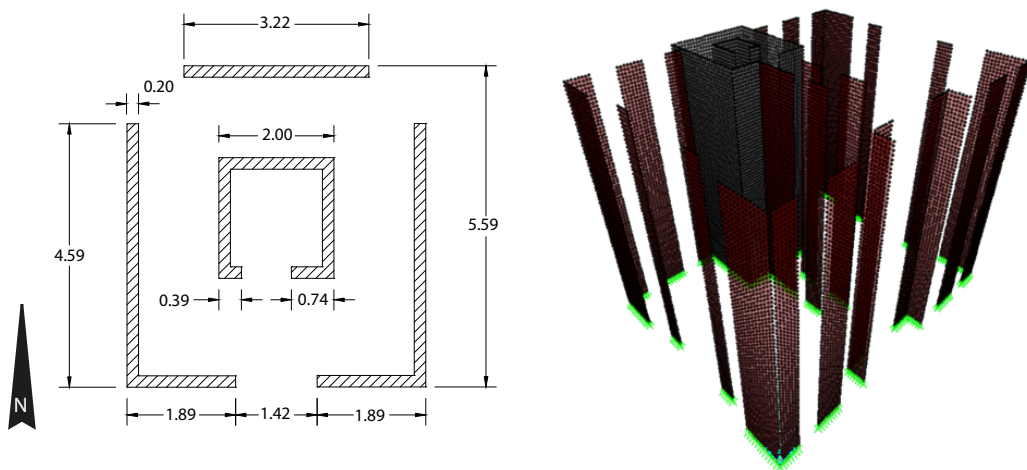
Layout of structural walls in the concrete core, with all dimensions in metres, and of the walls in the finite element model
